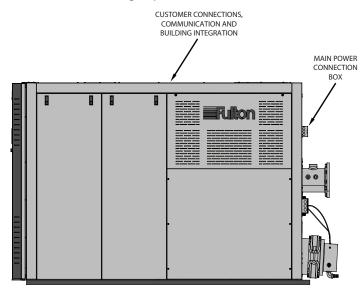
ELECTRICAL CONNECTION LOCATIONS (TYPICAL)
